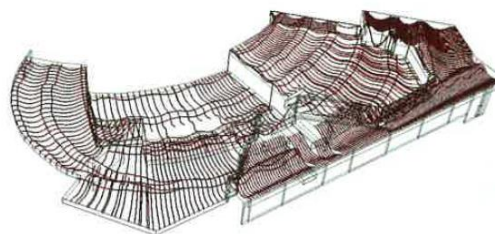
E-1 Beamless Flat Slab Construction Using Post-Tensioning (P134)
